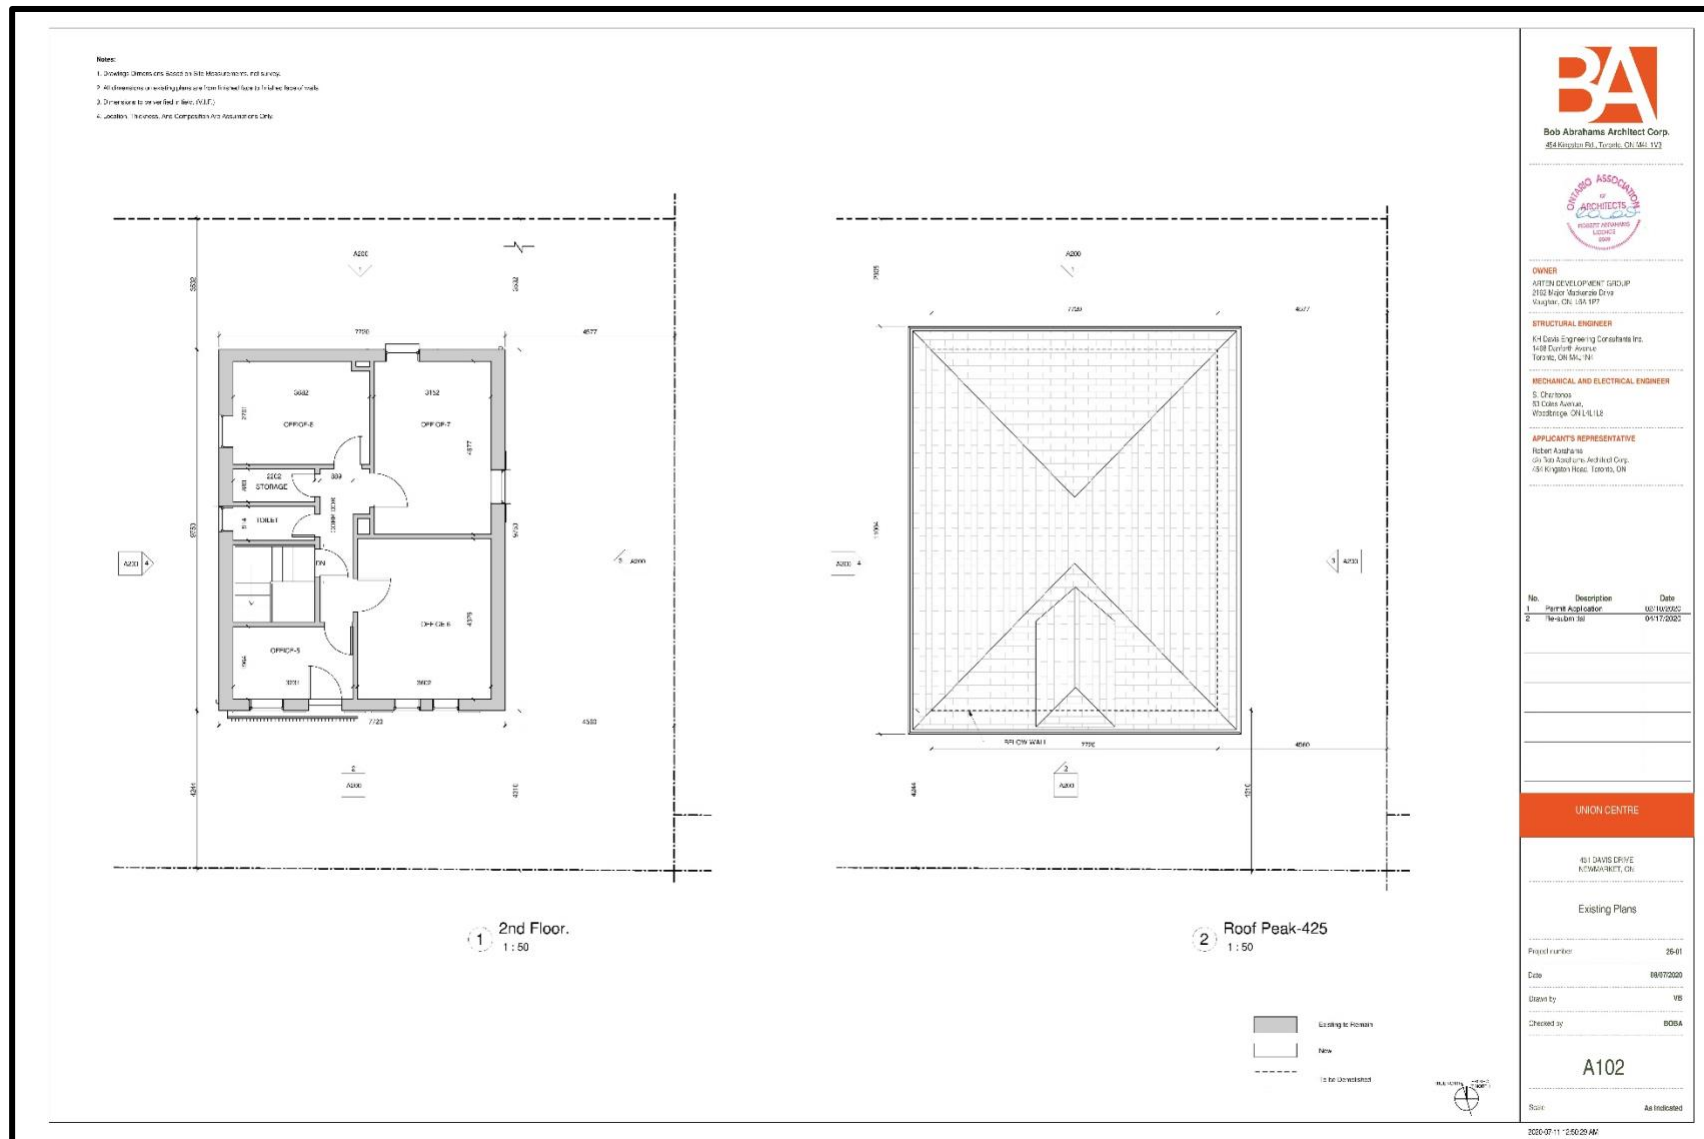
Existing 2nd Floor and Roof Layout for 425 Davis Drive
